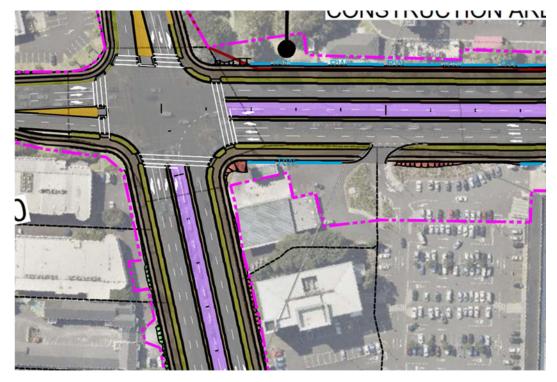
Plan showing the boundary and features of the NoR in relation to the subject site
